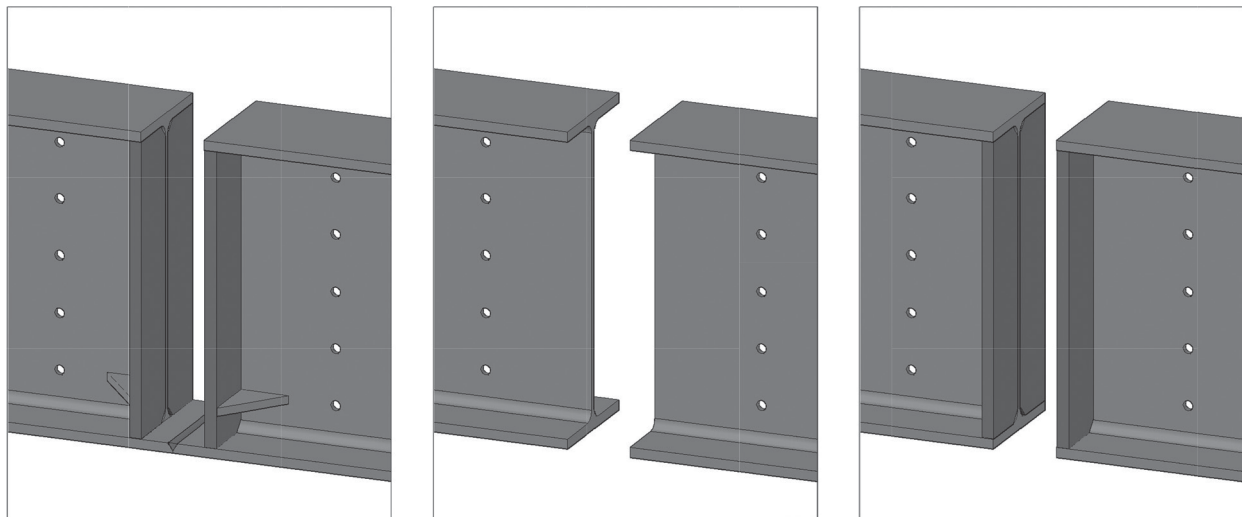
Details of test specimens inside the diaphragm: (a) specimen 1; (b) specimen 2; (c) specimen 3.
